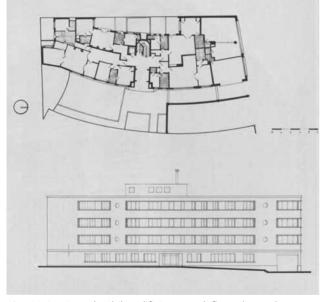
Santiago de Chile, Edificio Merced, floor plan and elevation
